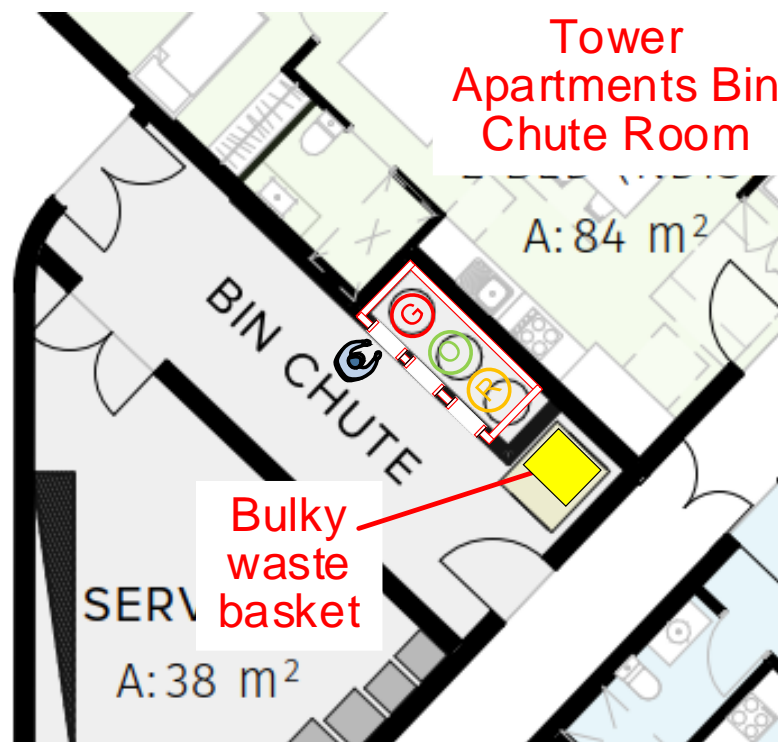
Example of Chute Bin Room for Tower Apartments
